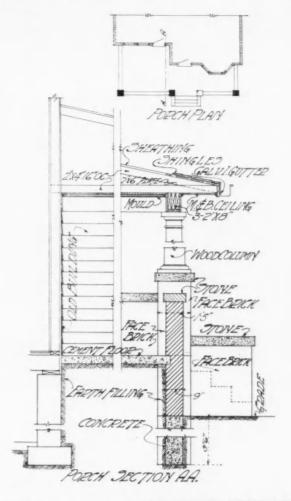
Structural Details of the All-Brick Wall Type of Construction in Which a Masonry Bond is Used Between the Face Brick Outer Courses and the Common Brick Backing.
